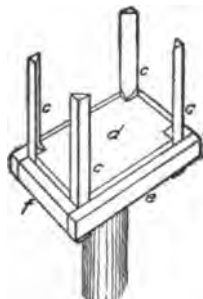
Floor and posts added to foundation shown in figure 13.
